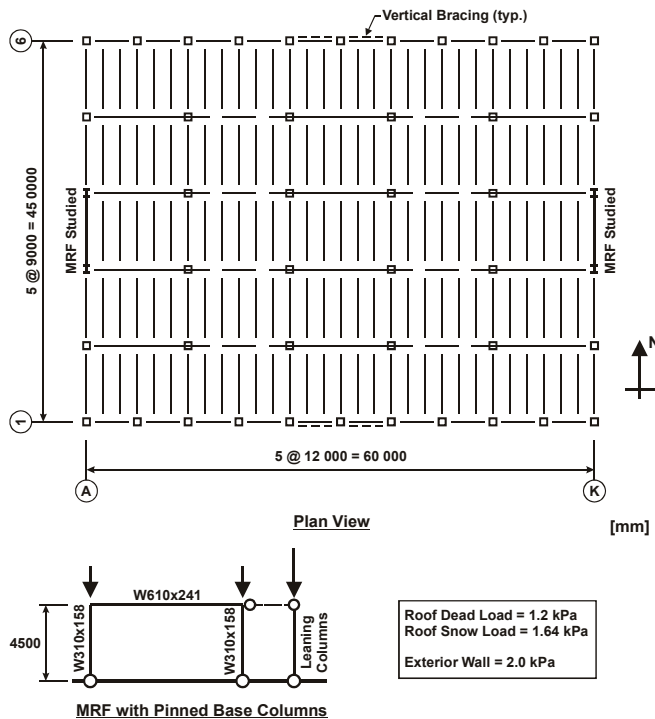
Plan view of the prototype industrial building and elevations of the studied MRF.
